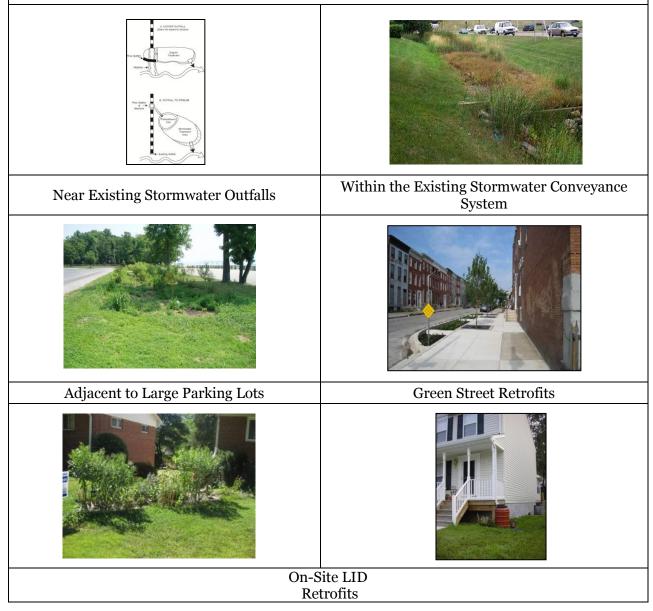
Examples of Existing BMP Retrofit Facilities and their Potential Applications
